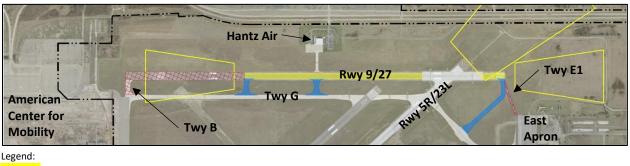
Alternative 3: Reconfigure Runway 9/27 to 5,000 feet by 100 feet at Approach End Runway 27
